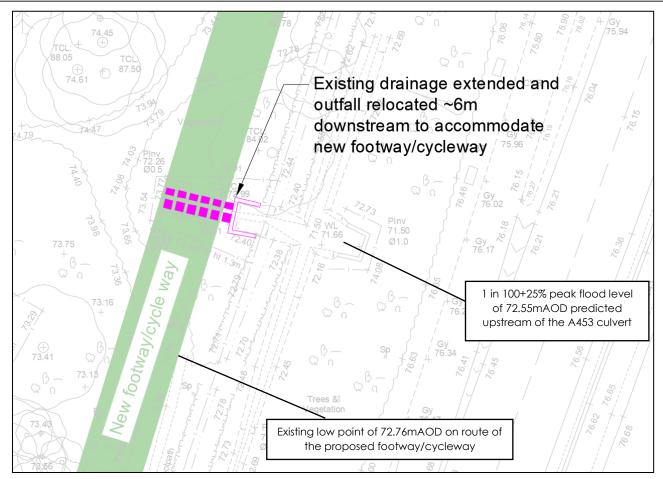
Concept Culvert Extension Beneath New Footway/Cycleway
